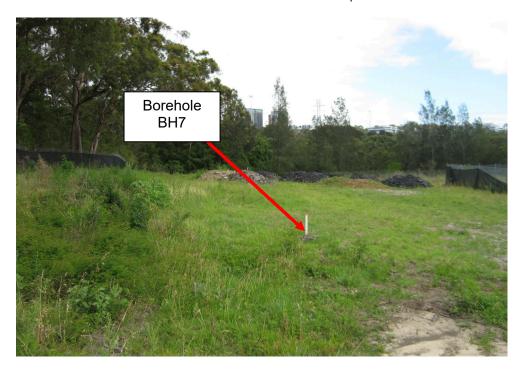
View north-west across a filled and levelled area on the lower level of the site, towards the Lane Cove River (beyond) and stockpiles of soil and excavation rubble. The location of Borehole BH7 is indicated as shown.
